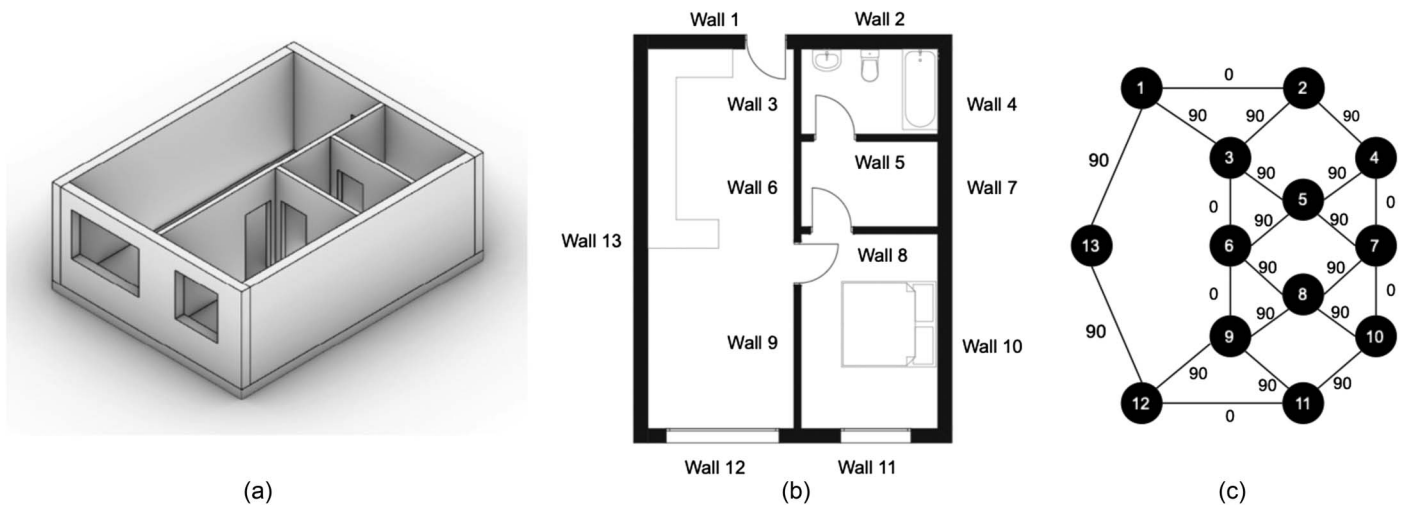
Floor plan and corresponding graph representation: (a) 3D model of the floor plan; (b) 2D view of the floor plan with identifiers of wall segments; and (c) graph representation where the nodes are mapped to the wall segments in plot (b), and the edge value, either 0 or 90, indicates whether a wall is parallel or perpendicular to another wall.
